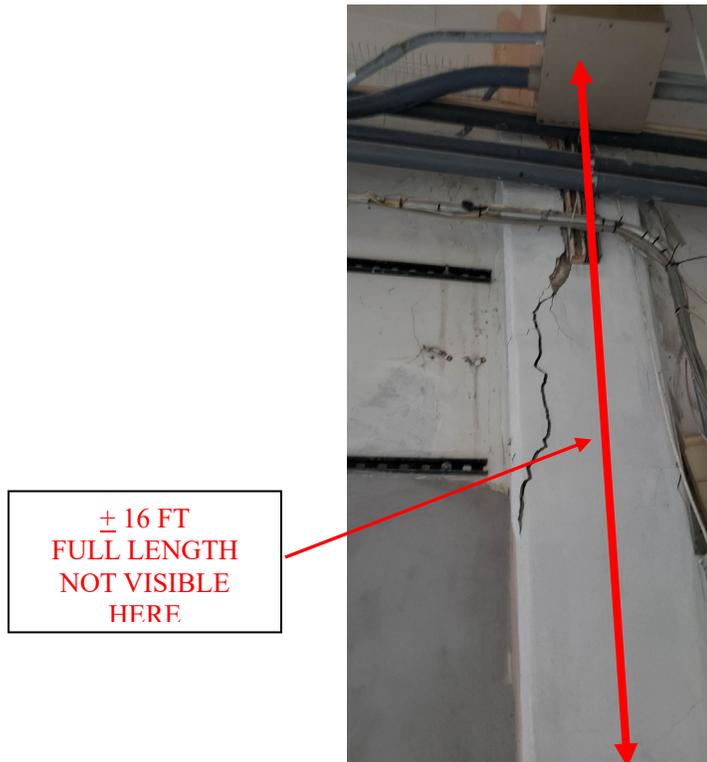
Interior of the Building. Location 4: Approximately 16 ft long new 16x16 concrete column. See detail 1/S101.
